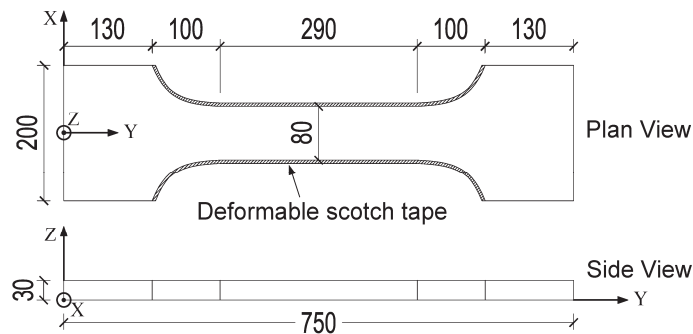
\_ SType2 specimen geometry (dimensions in mm)
